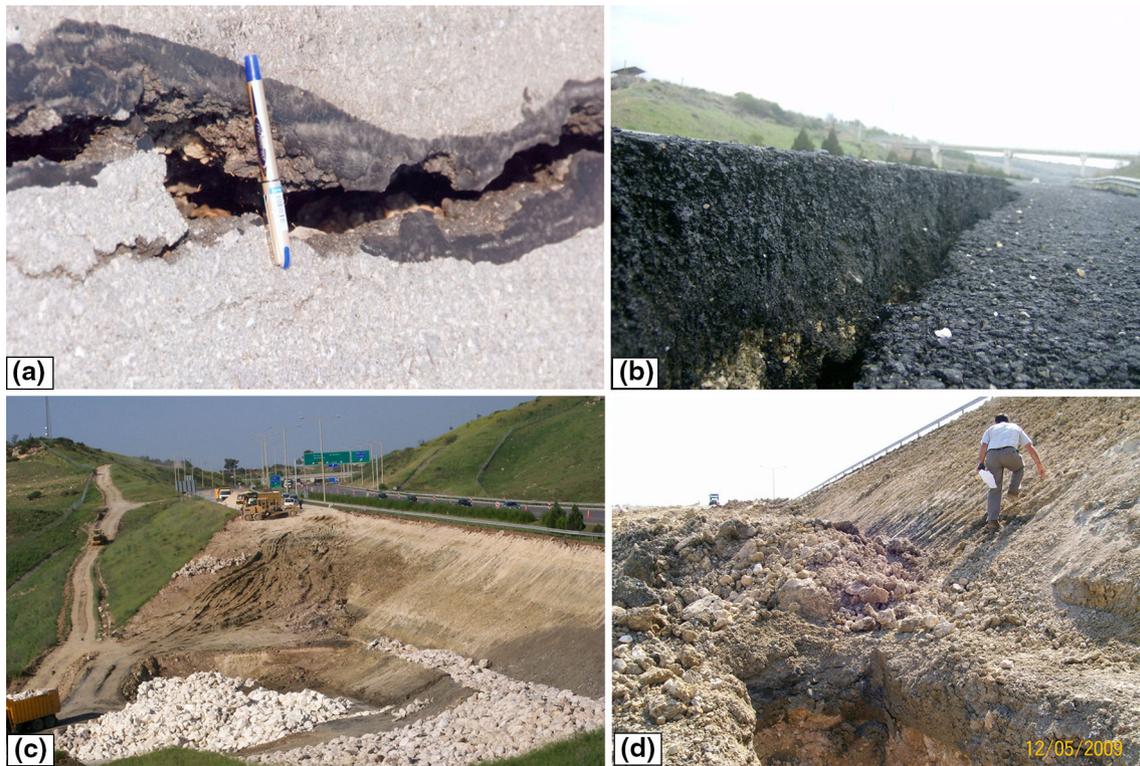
Tension cracks in the pavement before failure (a), a picture of straight scarp on embankment slide (b), general view from embankment failure at chainage km 10+800 (c) and a close-up view of a failure surface (d)
